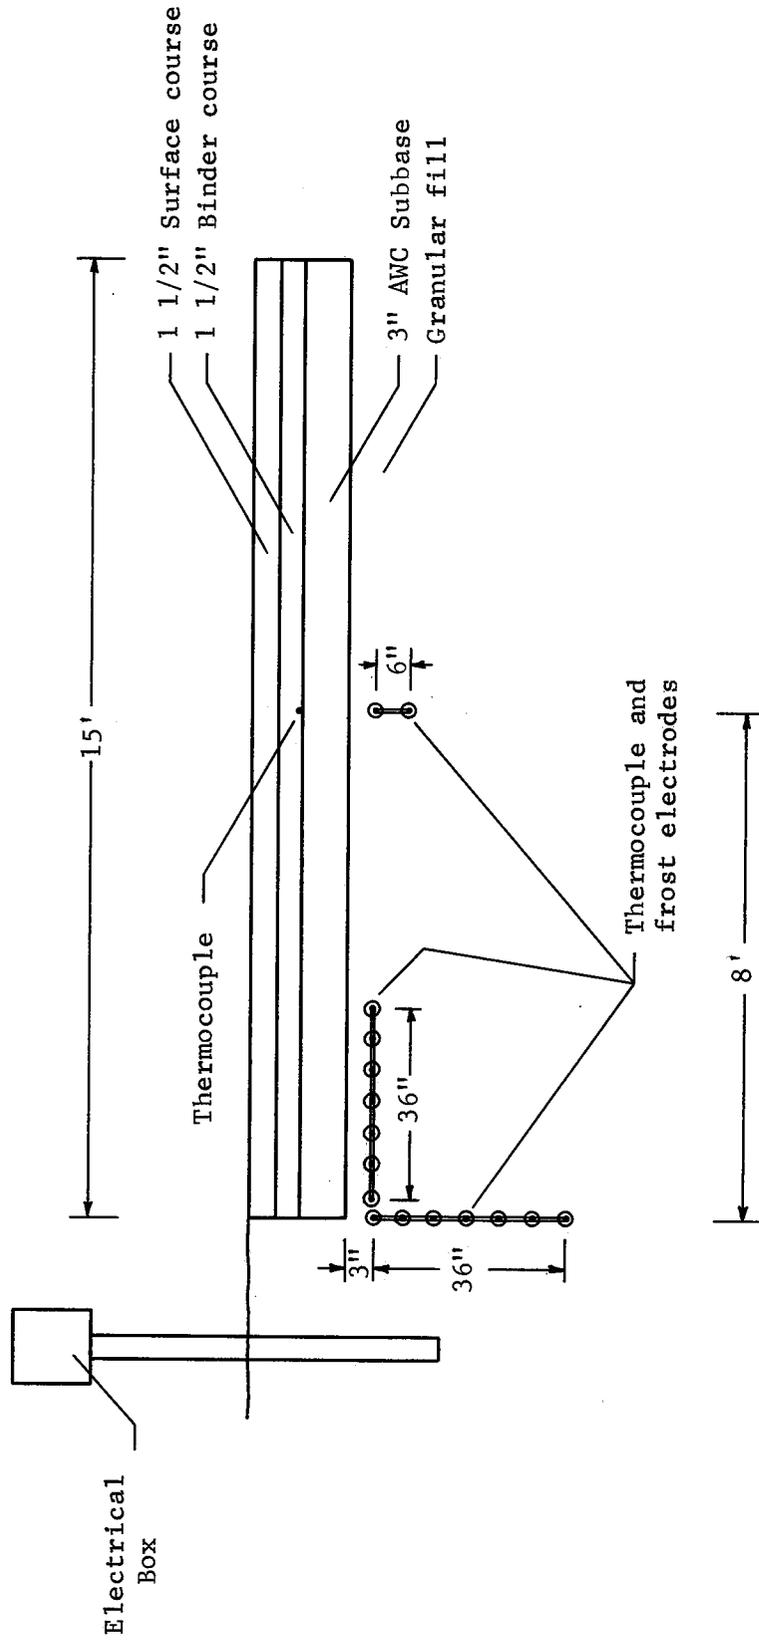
Typical cross section for Test Sections Nos. 1 to 3.
